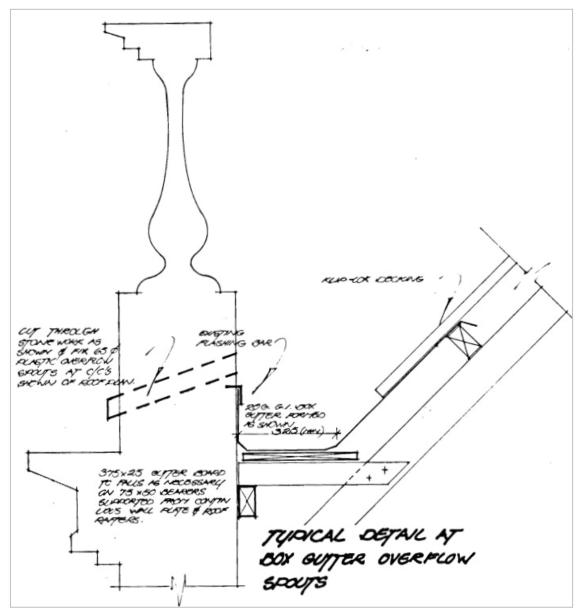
Detail from a drawing of the proposed mansard roof by the University of Adelaide Architect's Office dated May 1974. They clearly intended to install overflows to the parapet gutters, although this never happened. Note the references to Klip-Lok Decking and G.I. (galvanised iron) gutters.
